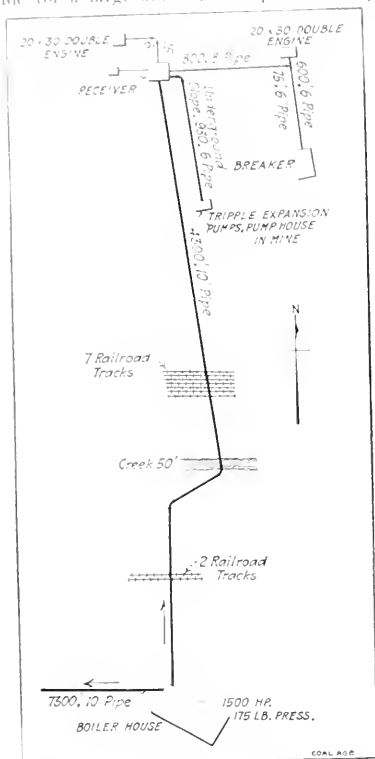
PLAN OF ONE OF THE PIPE LINES
